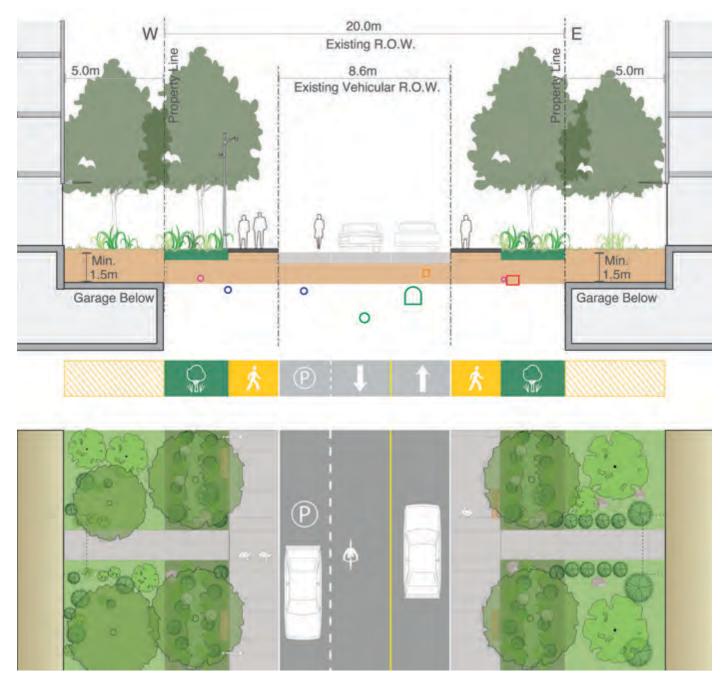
Section and Plan of Lillian and Dunfield Greenways - Recommended Final Condition
